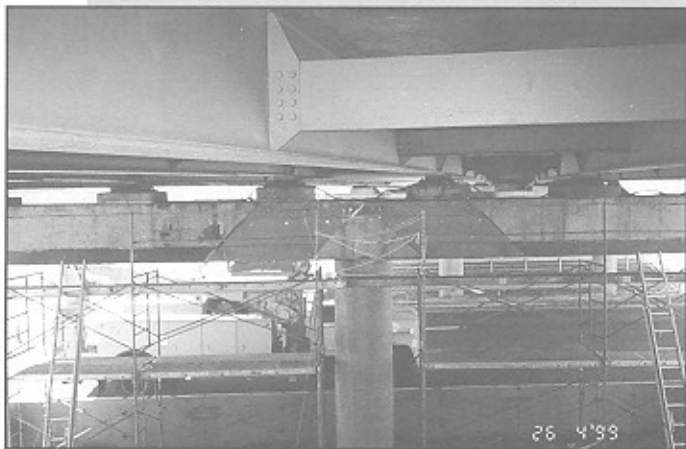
Repair of bridge cap-beam with bonded prefabricated panels
